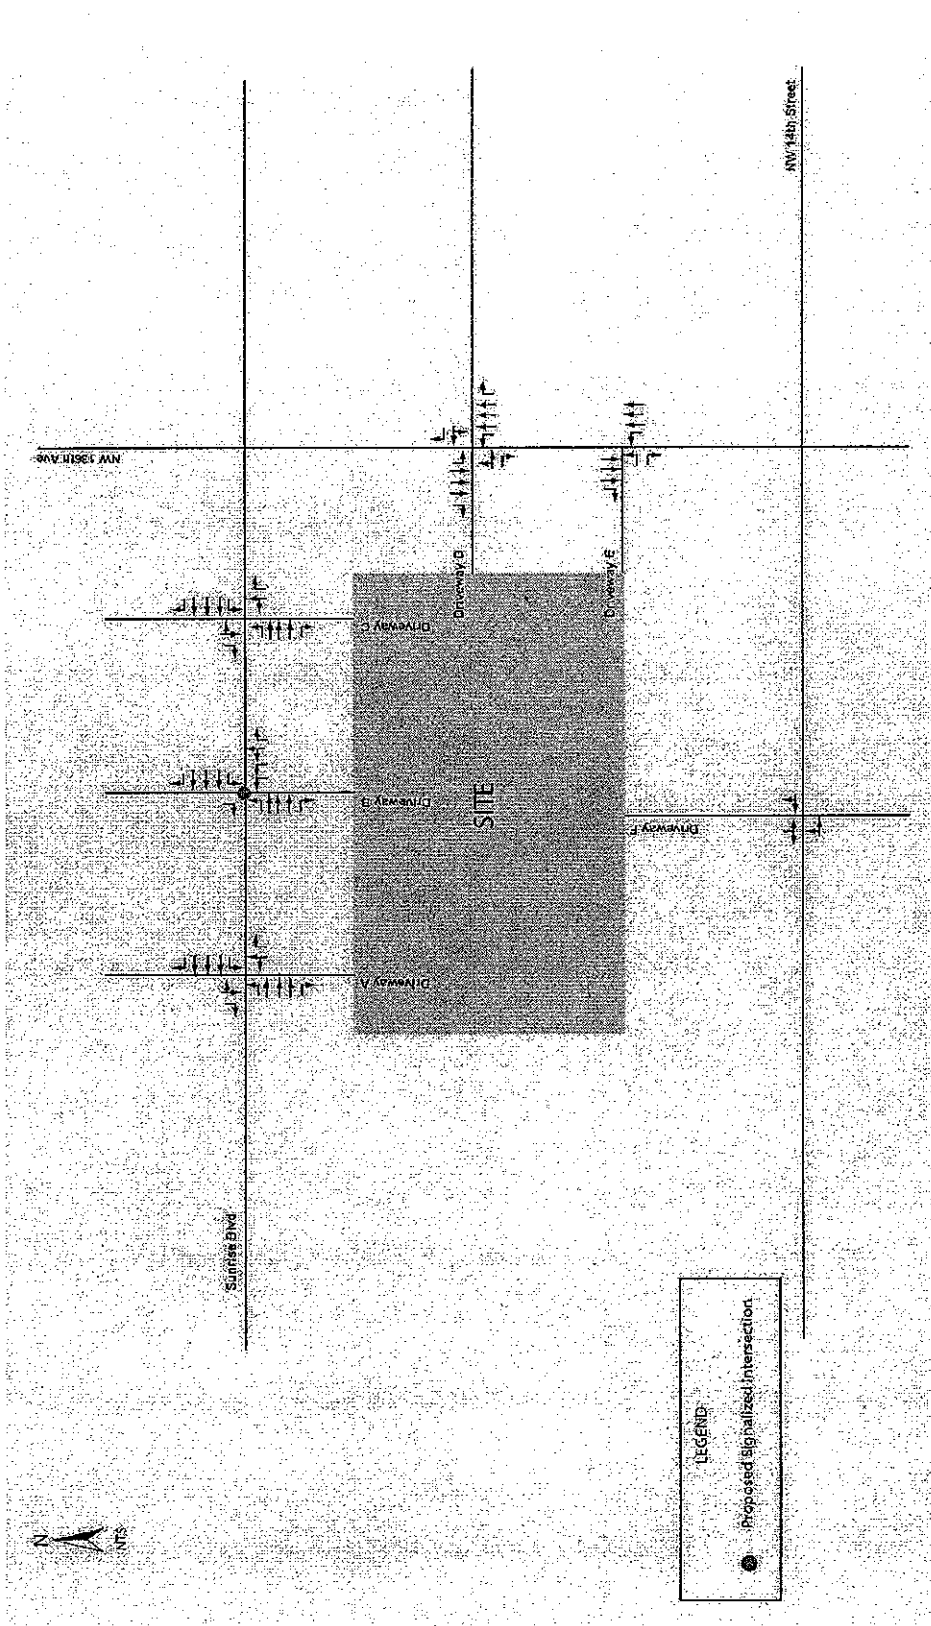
INTERSECTION IMPROVEMENTS
